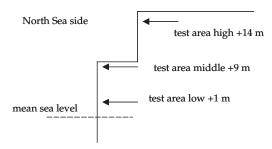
Schematic of a pier of Haringvliet spuisluizen (discharge complex)
